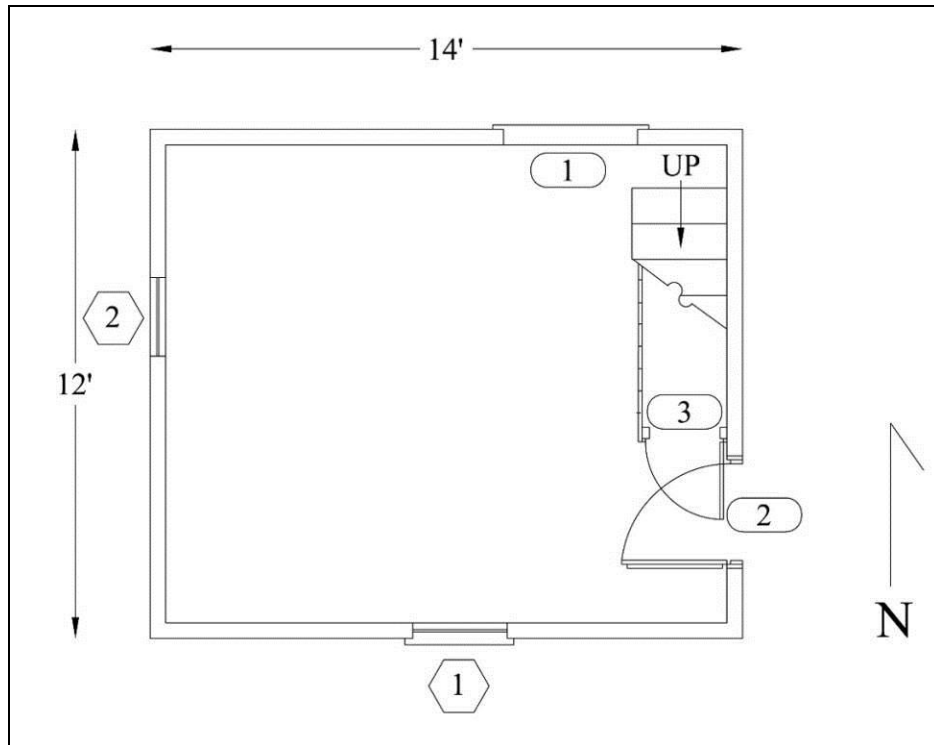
Sanford-Burgess Cabin, Detailed Floor Plan (Without Shed Addition).
